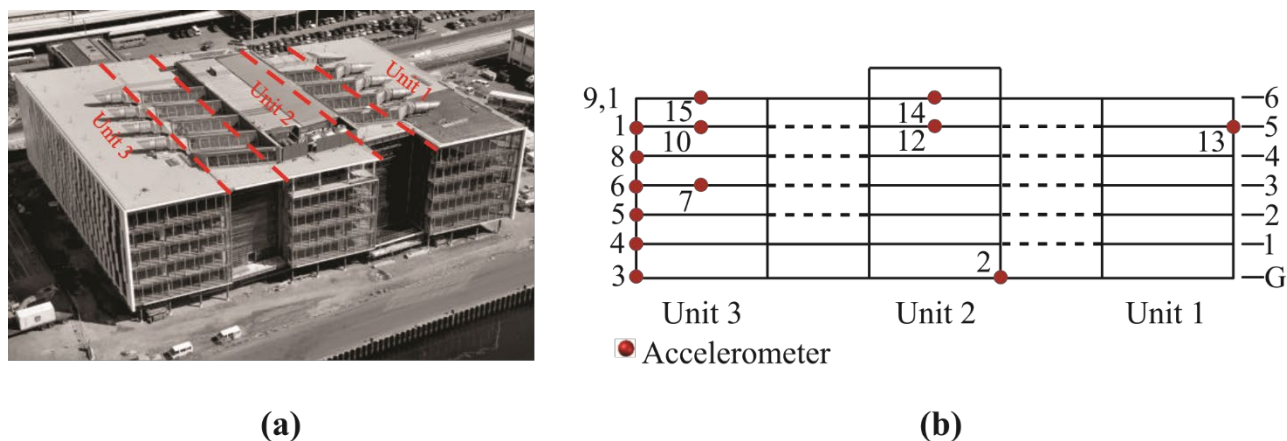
(a) The aerial photograph showing the BNZ Building. (b) Schematic showing the location of installed accelerometers in the BNZ building.
